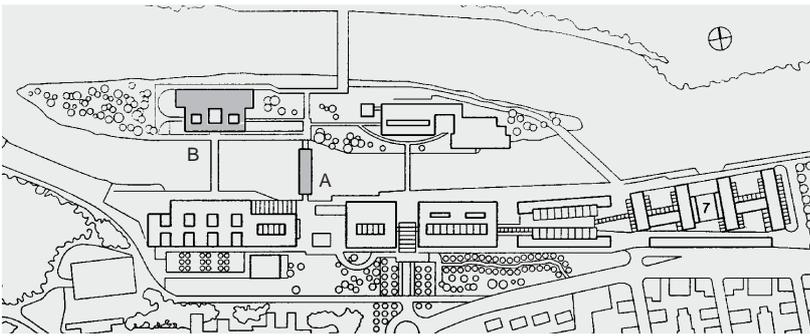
Site plan. The building on page 12-1 is A, the monitored building is building B.
